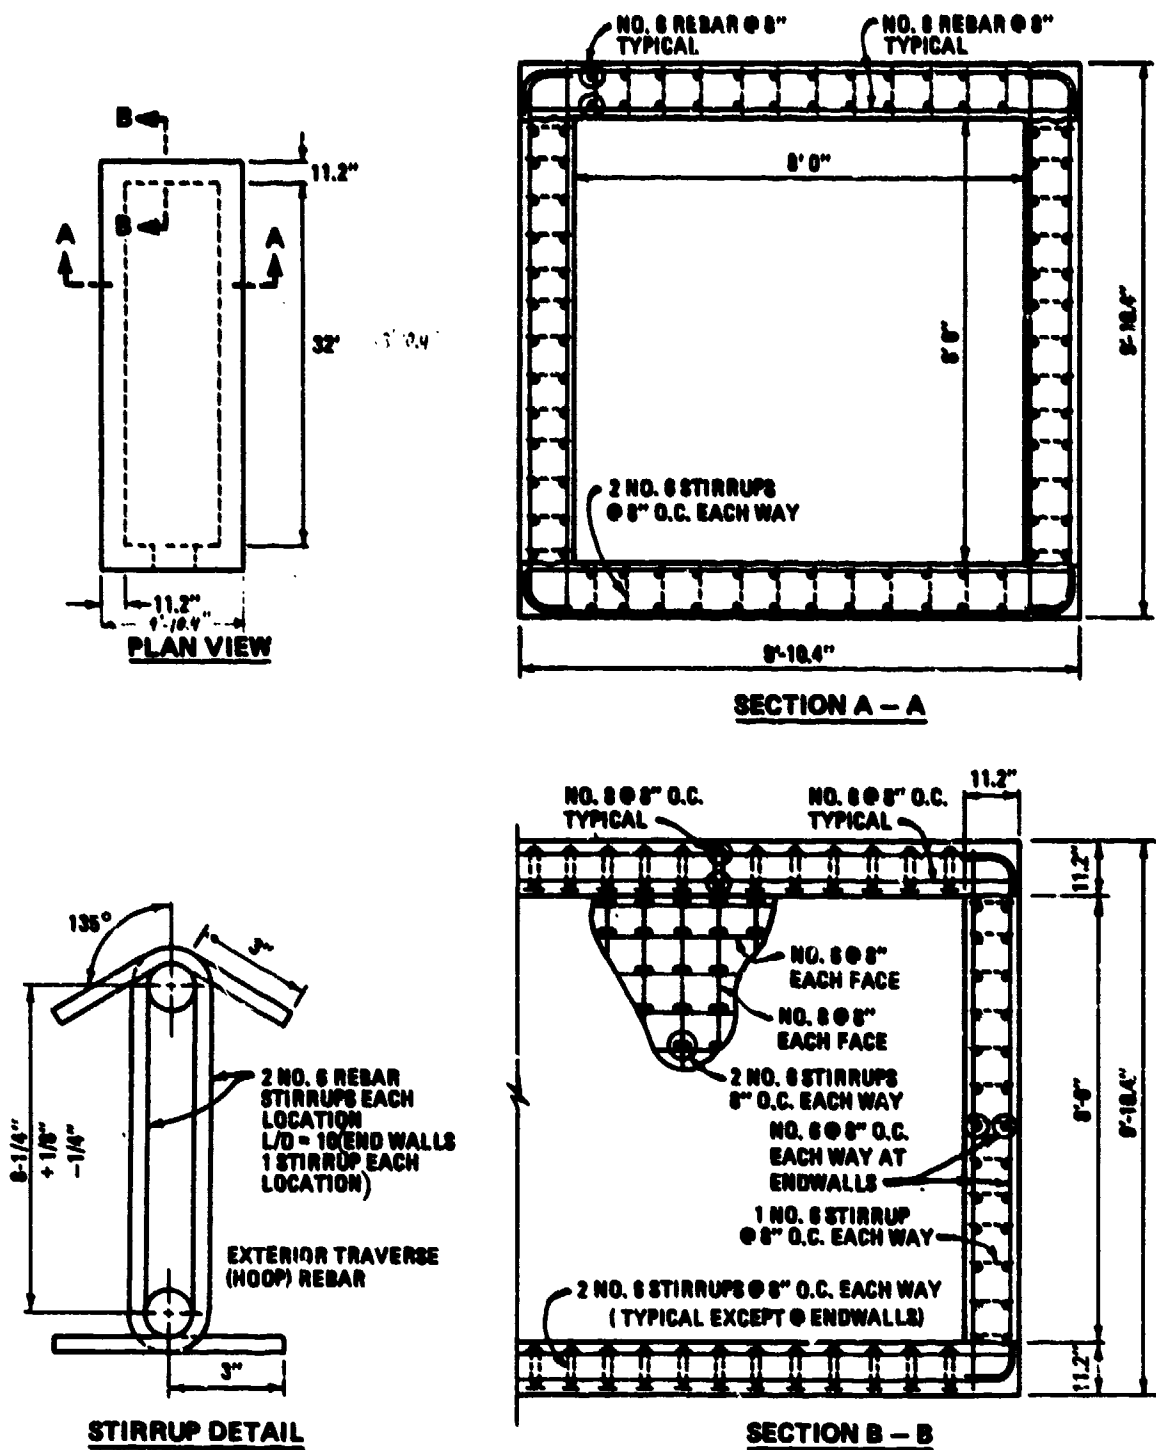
Reinforcement steel layout for the large reinforced concrete box.
